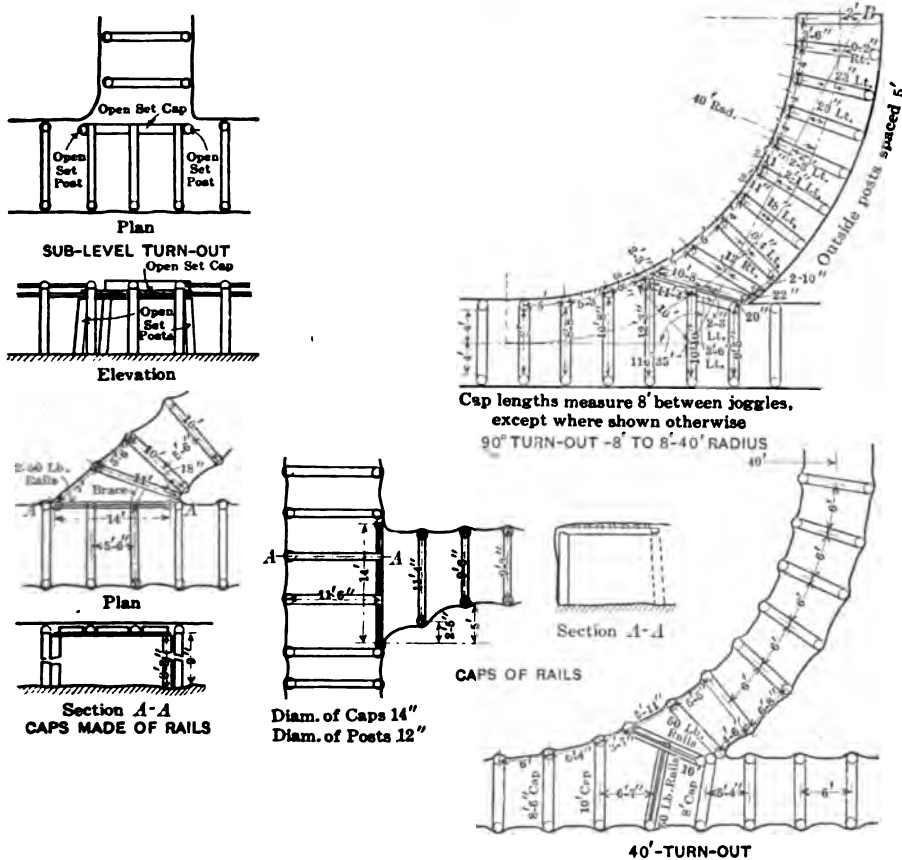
Timbering used in Mesabi mines at intersections. (*Eng. and Mining Journal*.)
